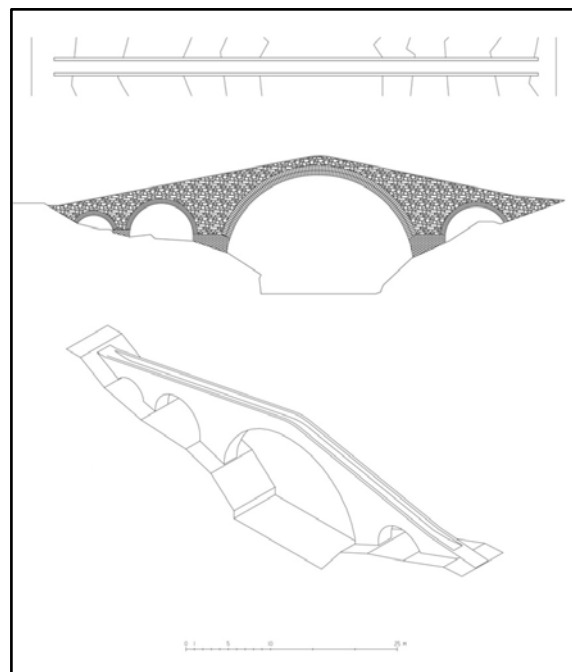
Plan, front elevation and axonometric view of Politsa stone bridge
